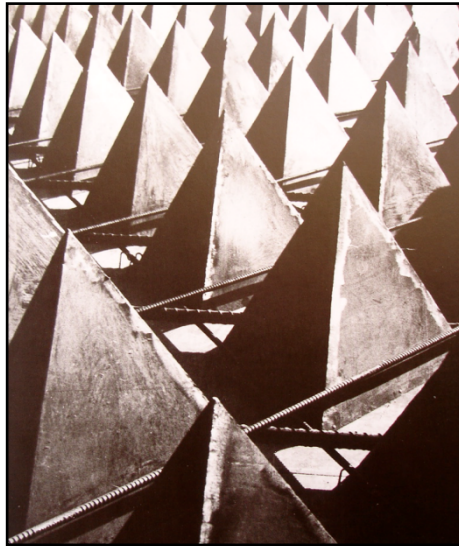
Bottom section of metal formwork for the concrete ceiling structure, Yale University Art Gallery. (McCarter, 2005, p.71)
